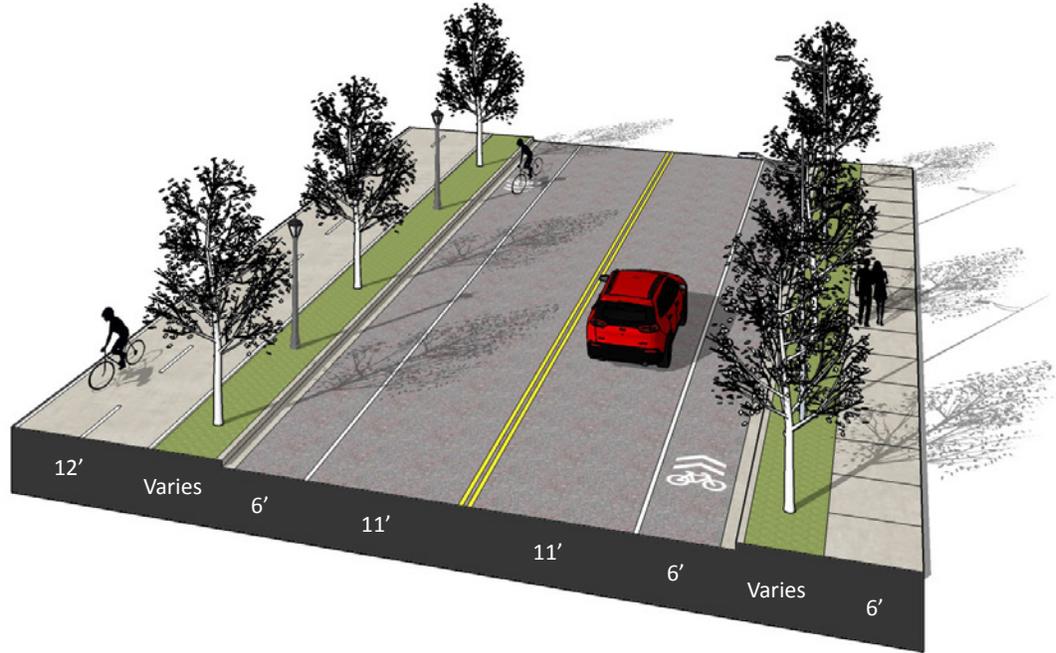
New construction emphasizing 12' bike trails and on street bike lanes
